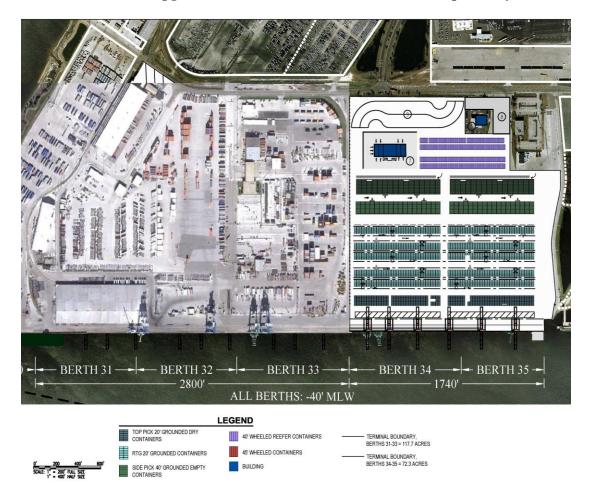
Upgrades at BIMT Container Terminal - Conceptual Layout
